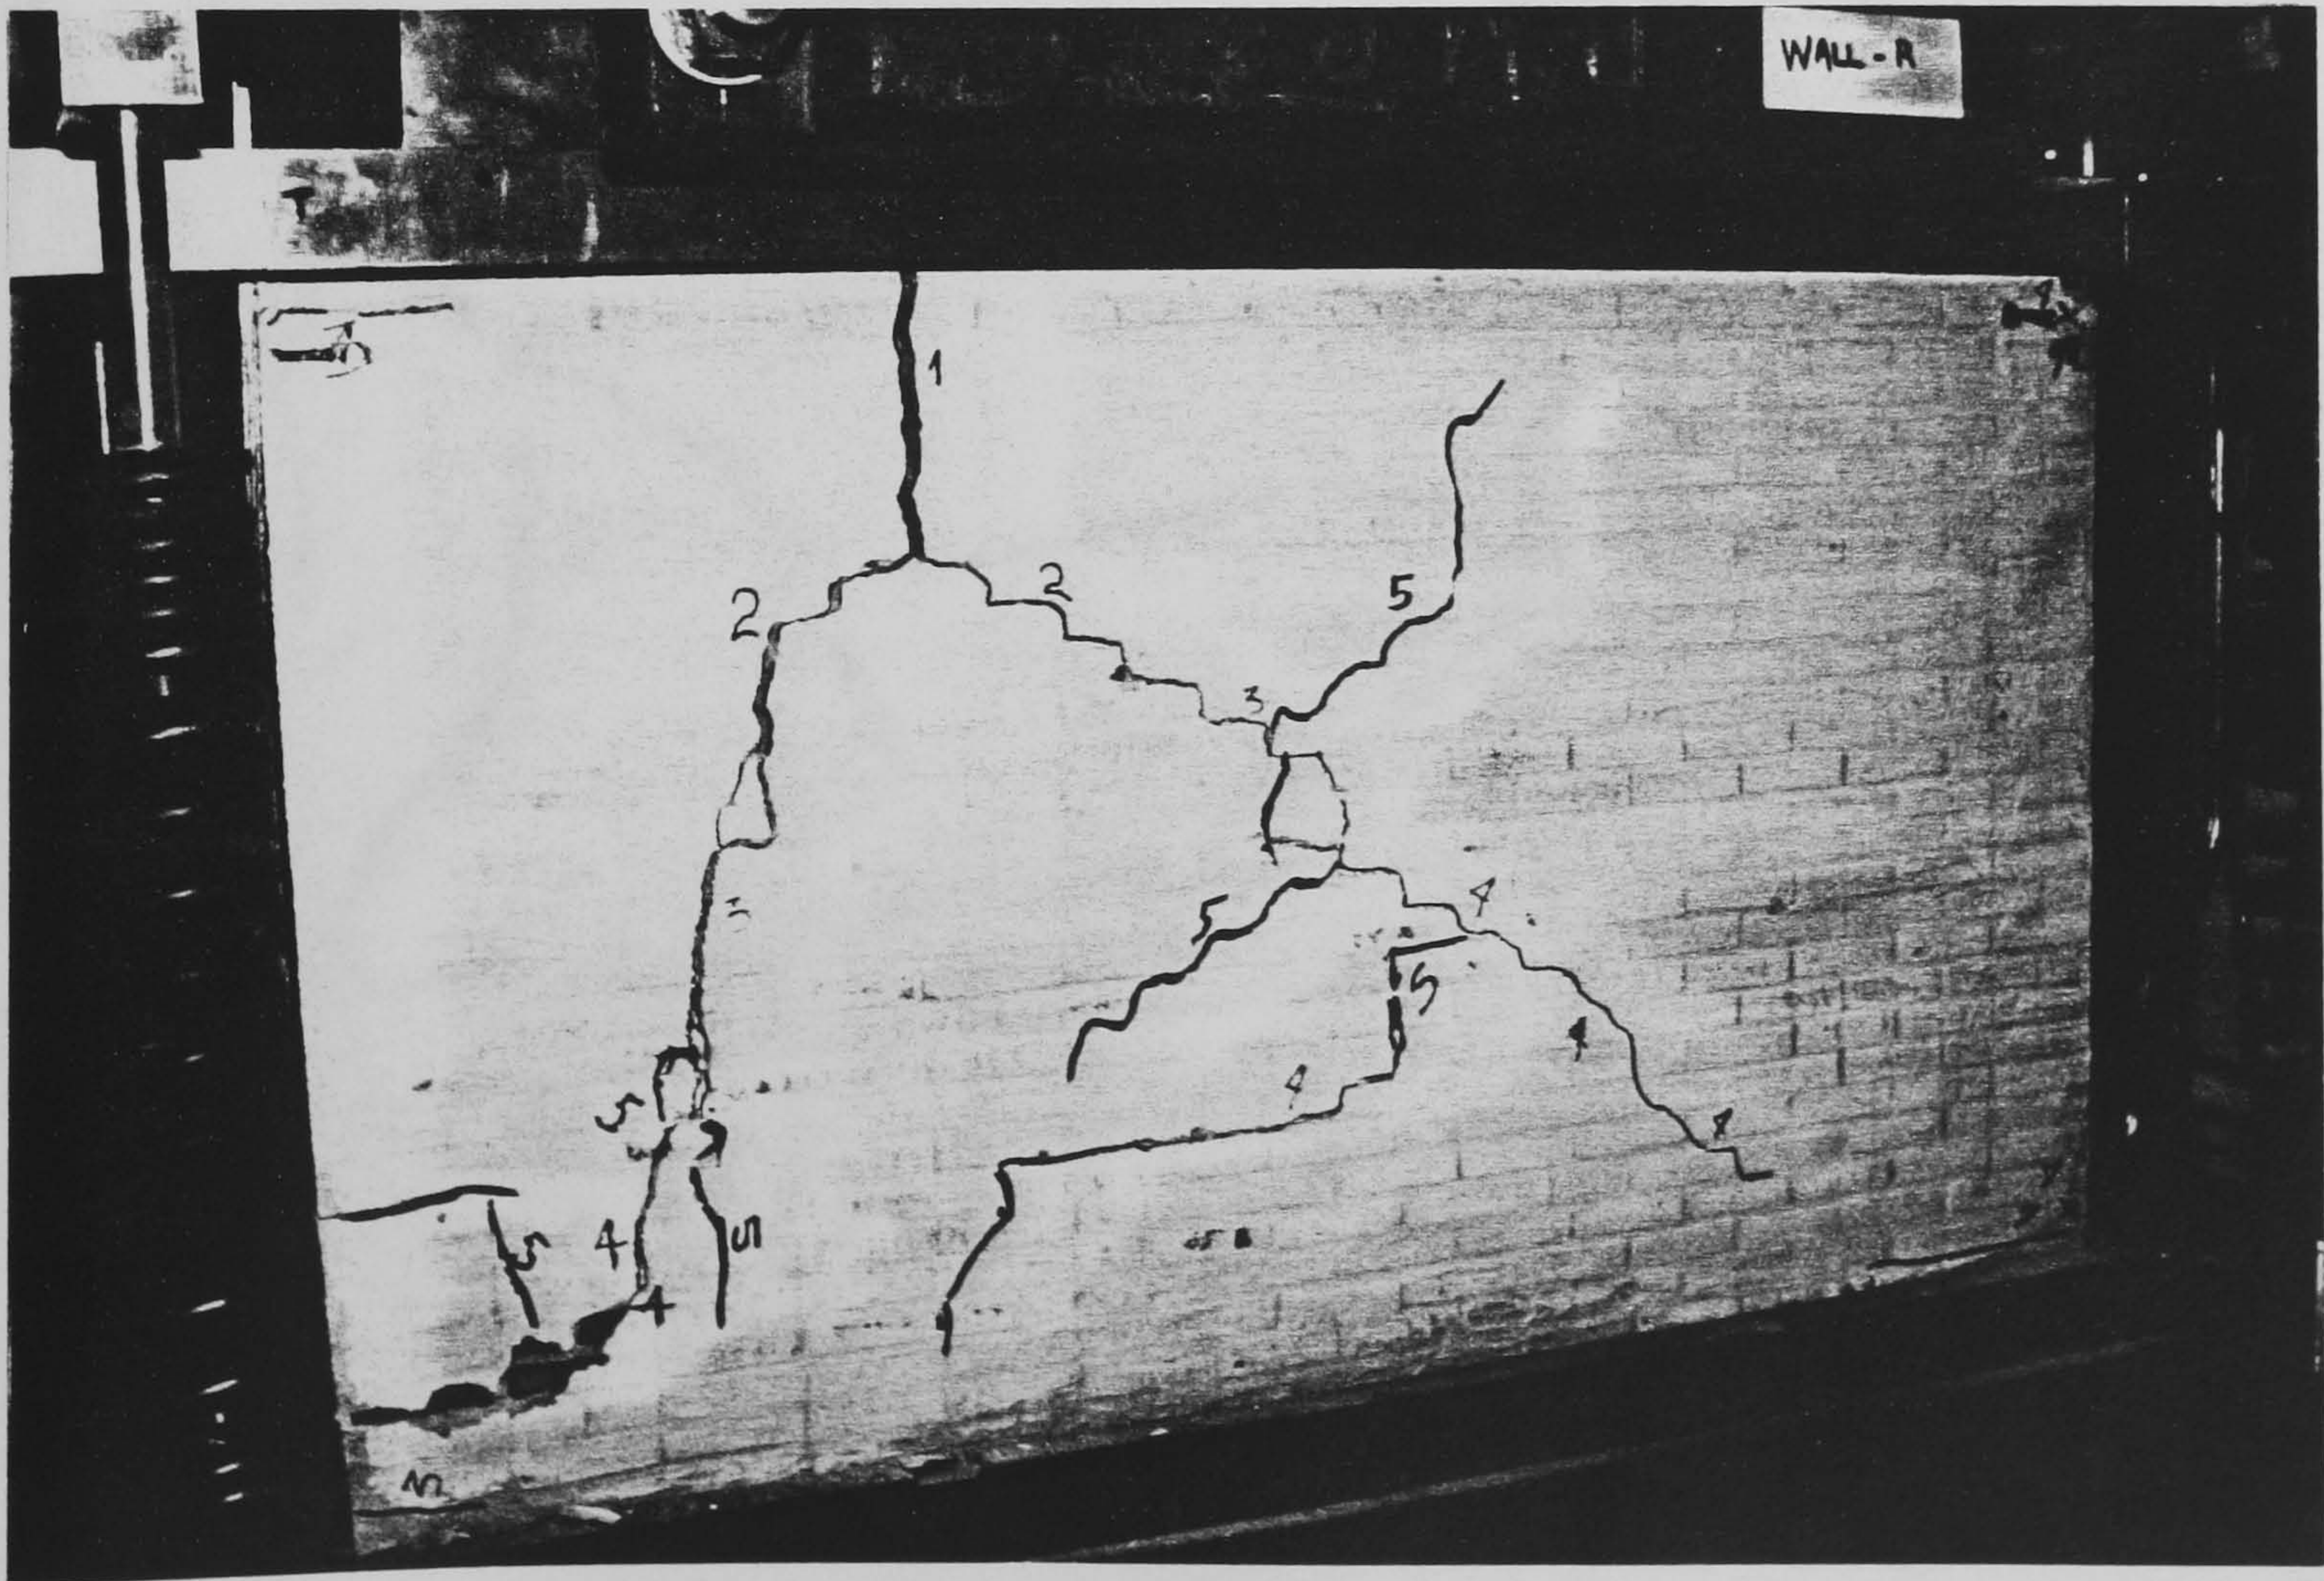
Crack 5, widening of crack 1 and corner crushing (wall-R)
